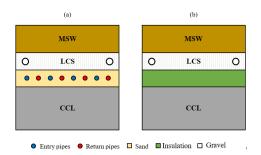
Schematic landfill cross-section following the installation of a: (a) cooling pipe system; (b) insulation layer
